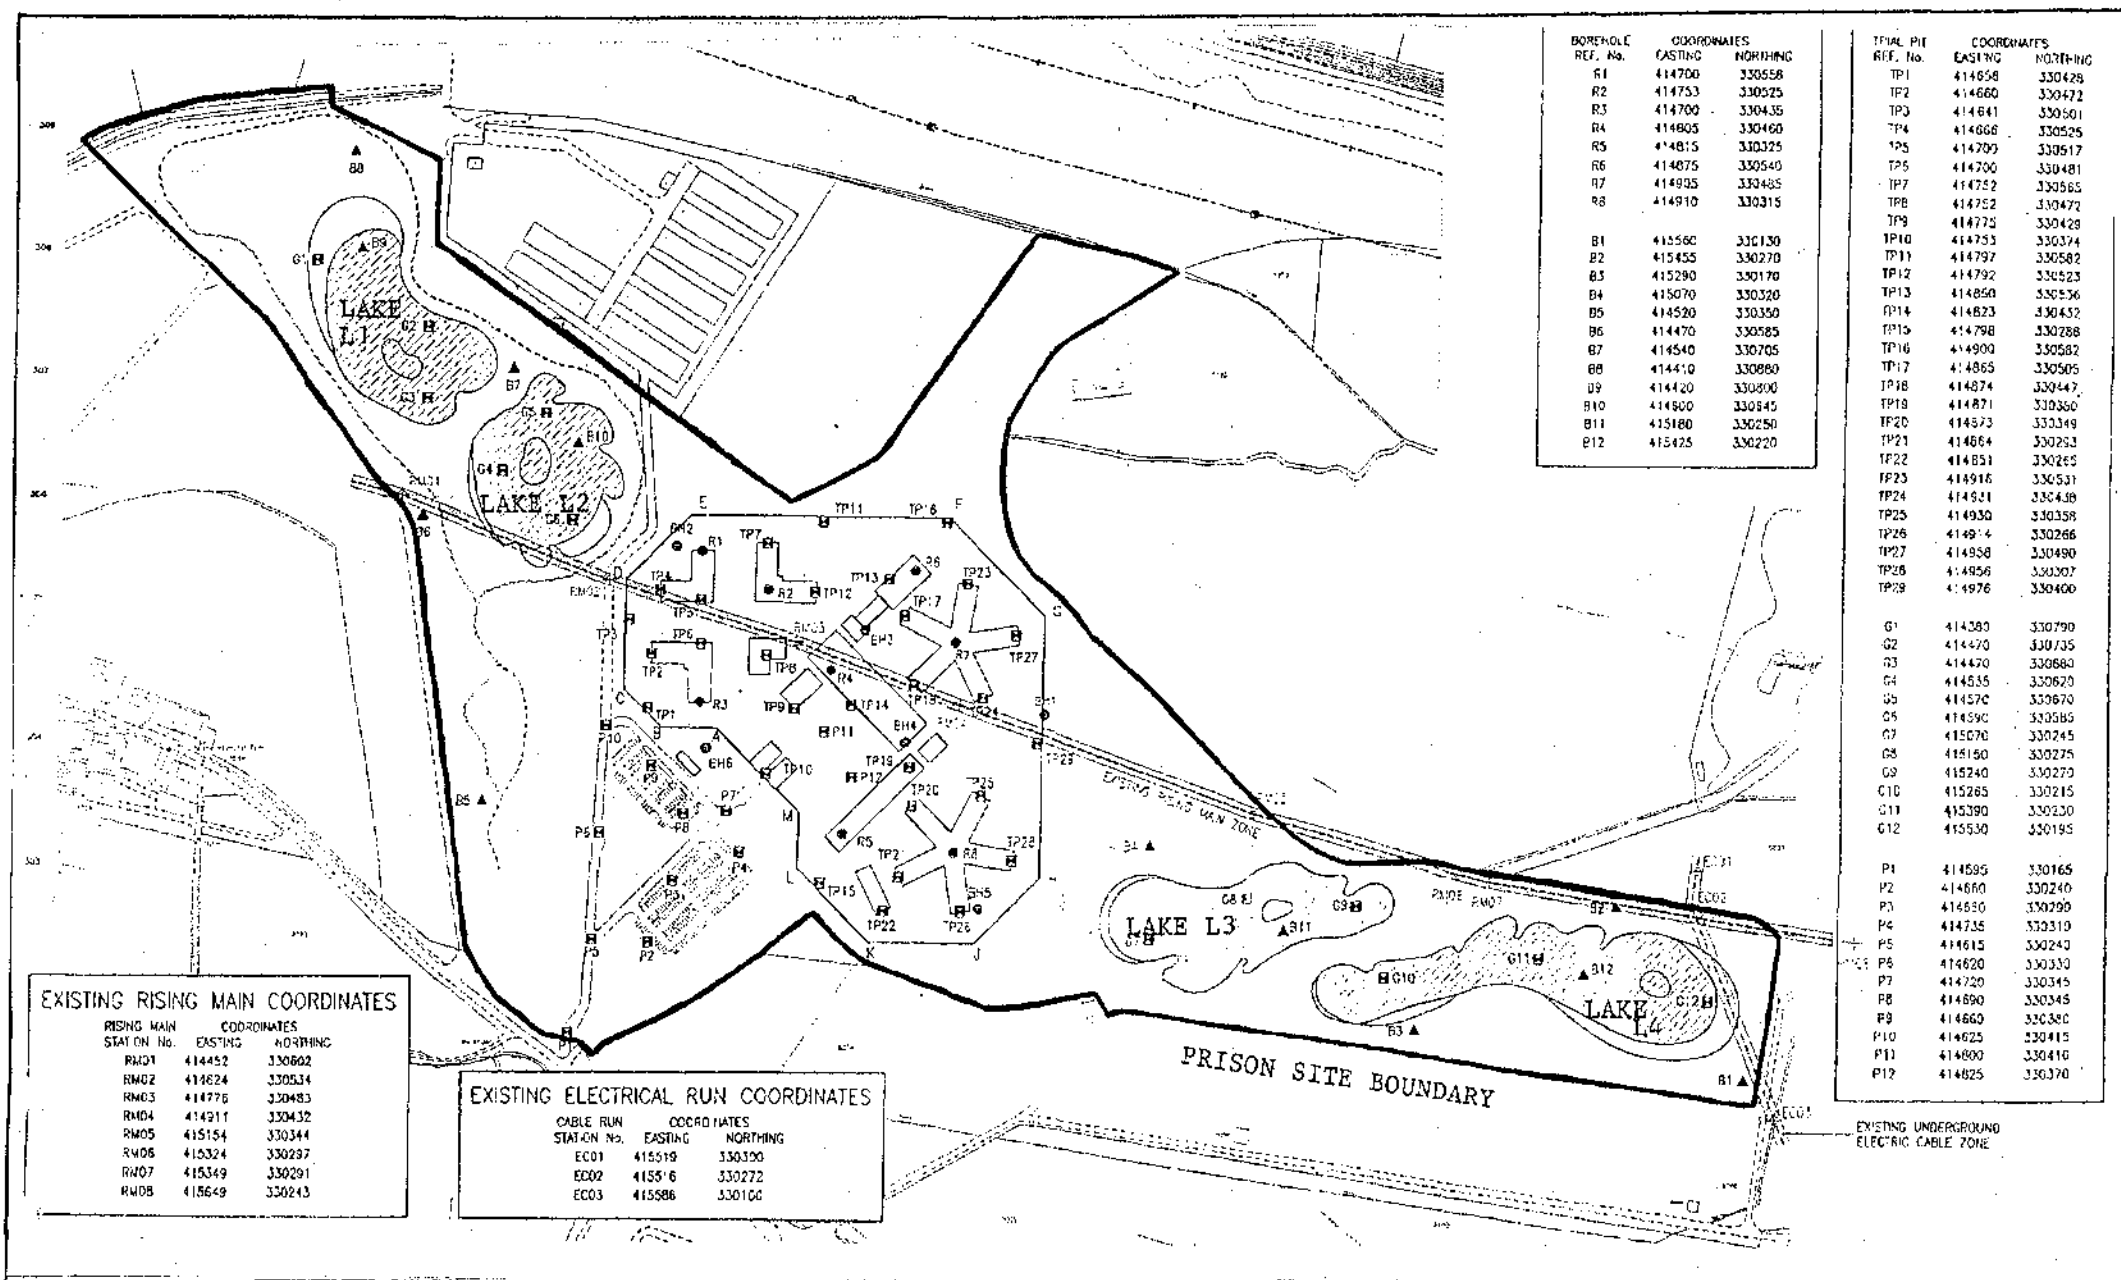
Layout of Marchington Prison, taken from Kvaerner Technology Site Plan. Scale 1:2500.
